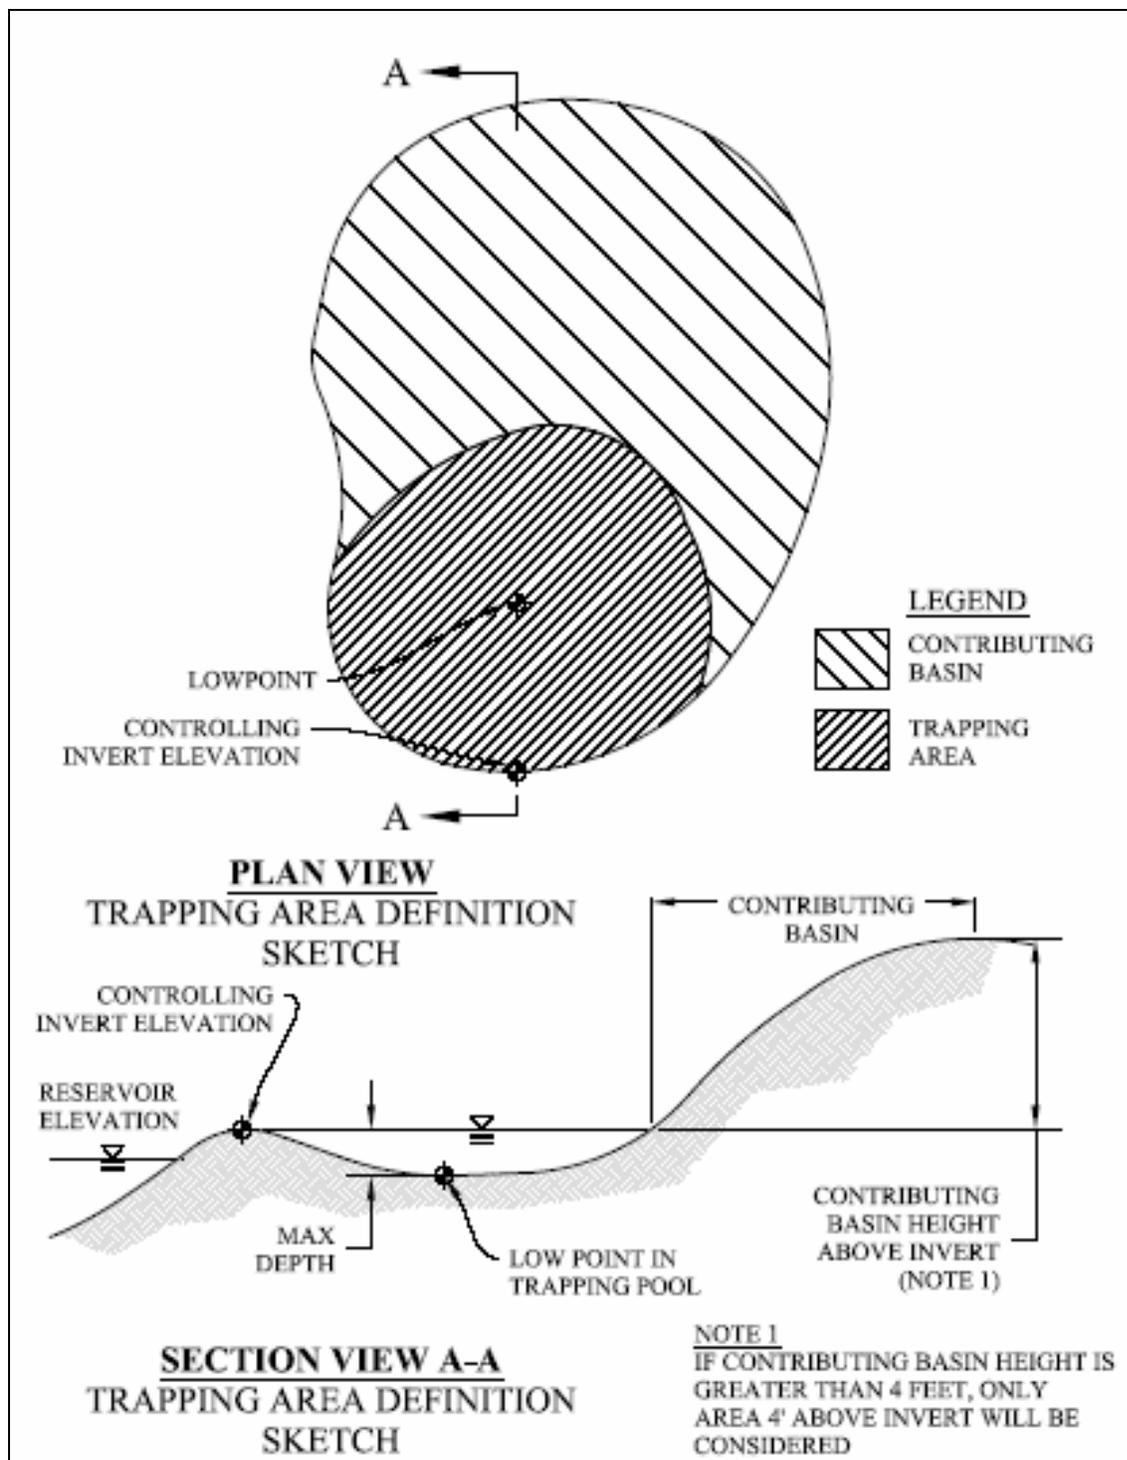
Conceptual sketch of trapping area, plan and section views.
